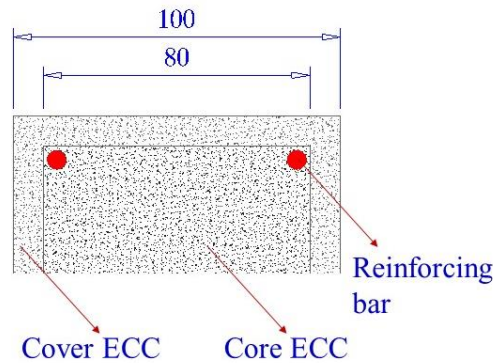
Cross-Section of cantilever column diagram (unit: mm)
